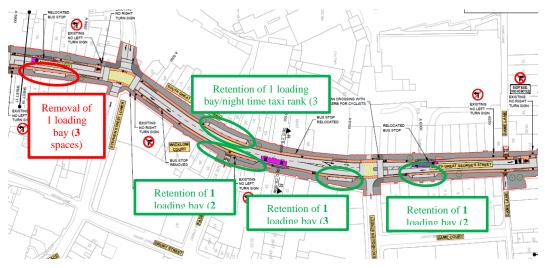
Proposed scheme design on Aungier Street and South Great George's Street
